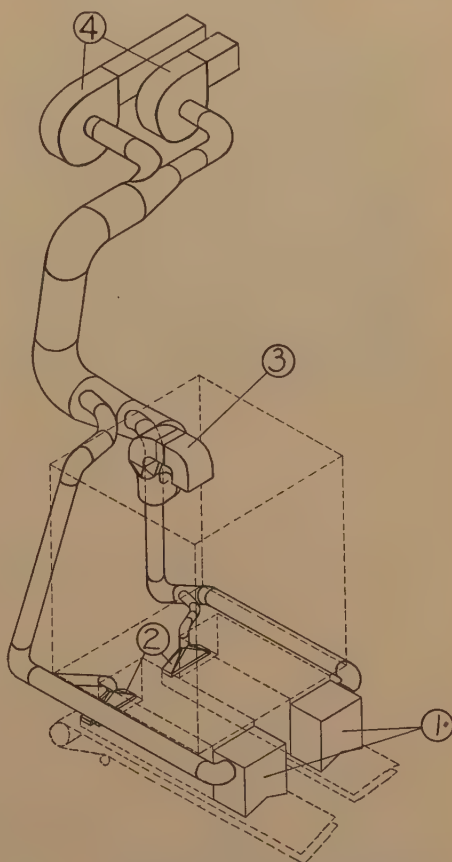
ISOMETRIC SKETCH OF PIPING LAYOUT IN EXHAUST SYSTEM OF INTERMEDIATE CRUSHING PLANT.
